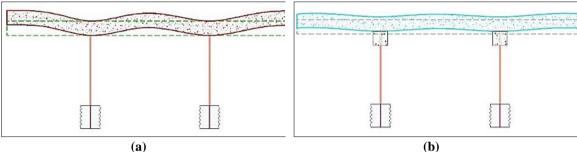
Anchorage system to reduce differential displacements in hydraulic structure slabs: (a) conventional anchorage system; (b) deformable anchorage system with high deformable concrete (HDC) elements.
